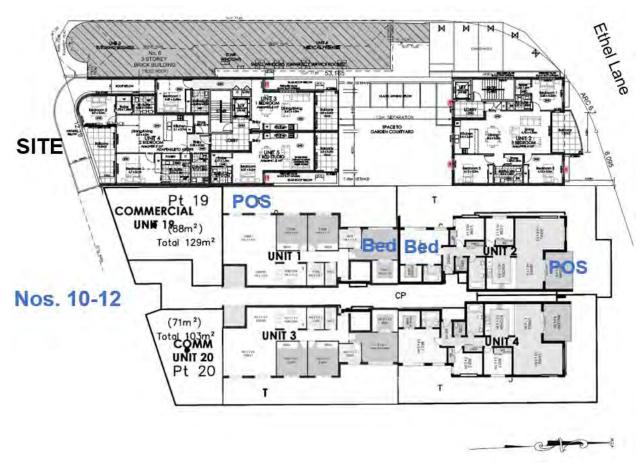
Extract from the First Floor Plan (top) and an indicative layout of the Ground Level of Nos. 10-12 Ethel Street. The main bedrooms of Units 1 and 2 (adjacent to the proposed central courtyard) are shown in blue. The primary private open space area which adjoins their living areas is also shown in blue.
